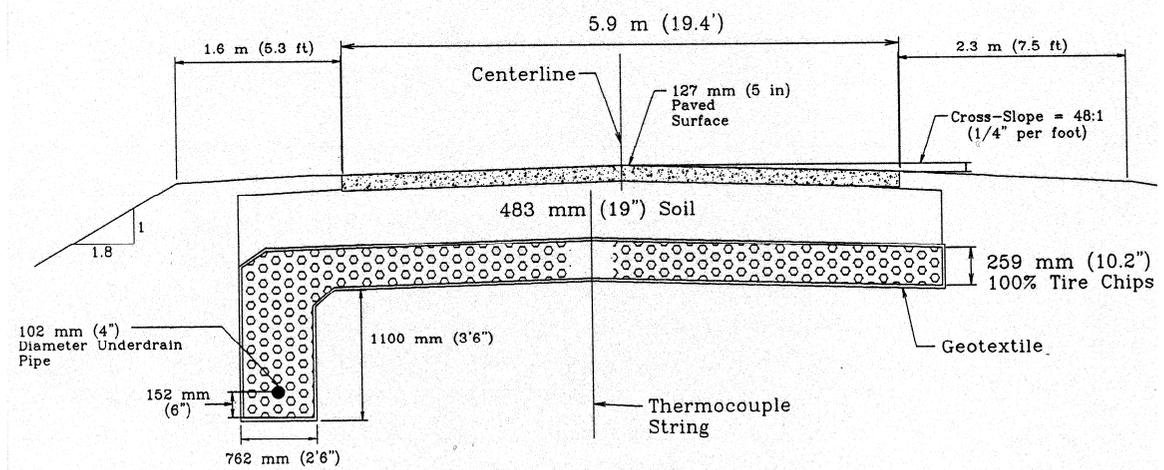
Typical cross section using tire shreds for insulation and drainage on Witter Farm Road.
